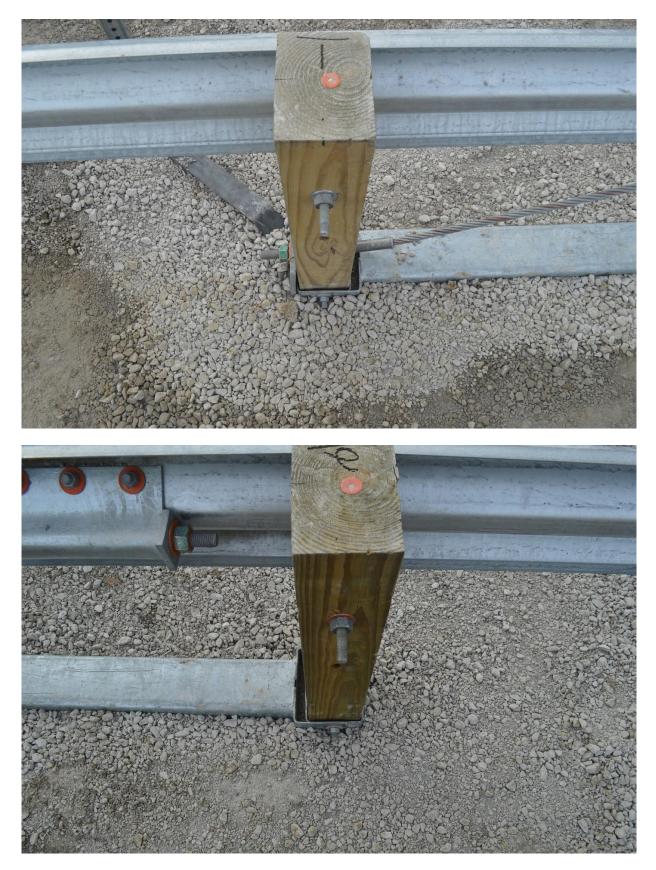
Damage to Upstream Anchorage System, Test No. CMGS-2
